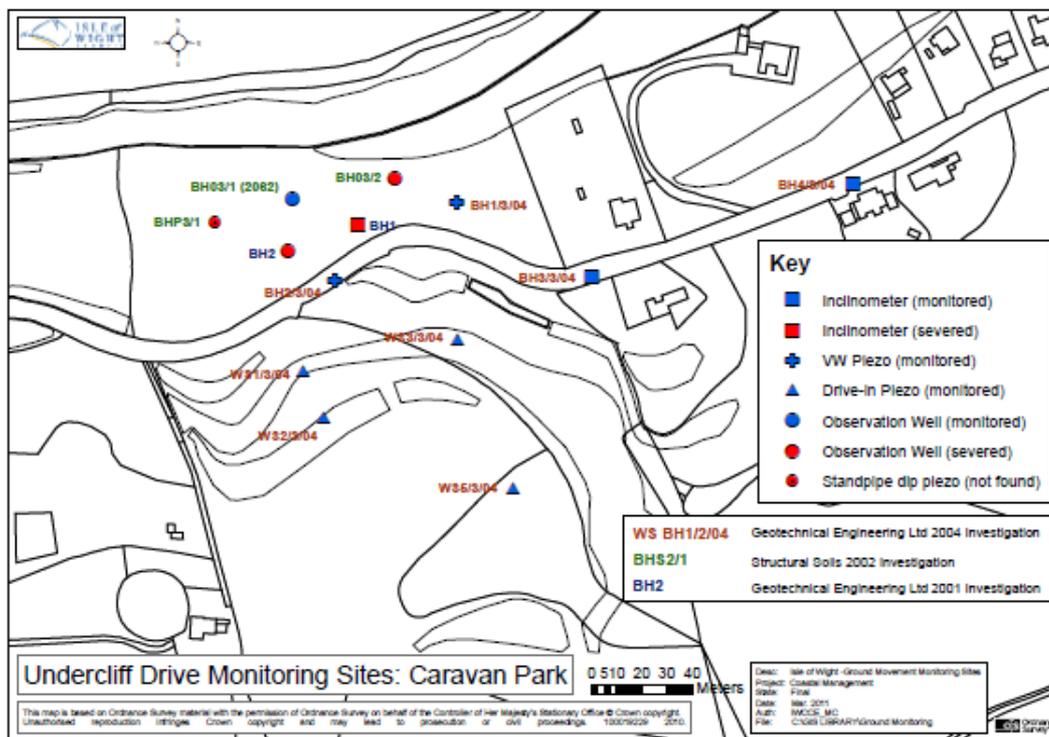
Undercliff Drive Site 10 Monitoring Location Plan
